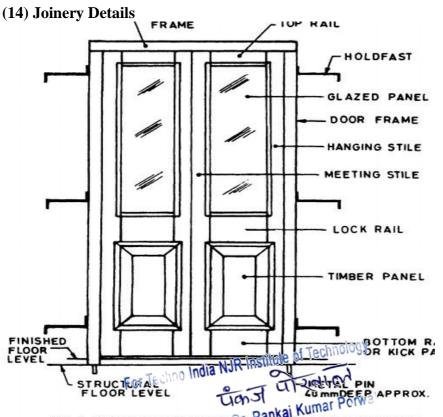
TYPICAL ILLUSTRATION OF DOUBLE PANELLED DOOR WIT
